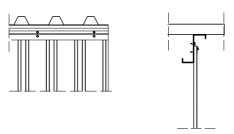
Sample installation of mcr PROSMOKE ST steel curtain along beam
